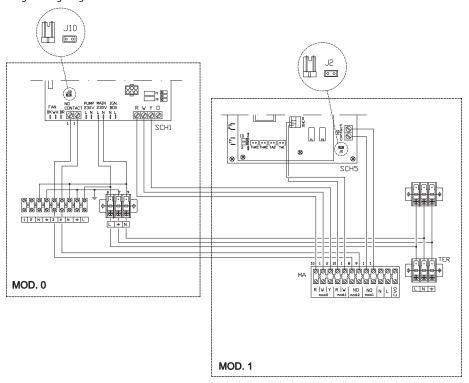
Gitié package wiring diagram (unit AY00-120)
